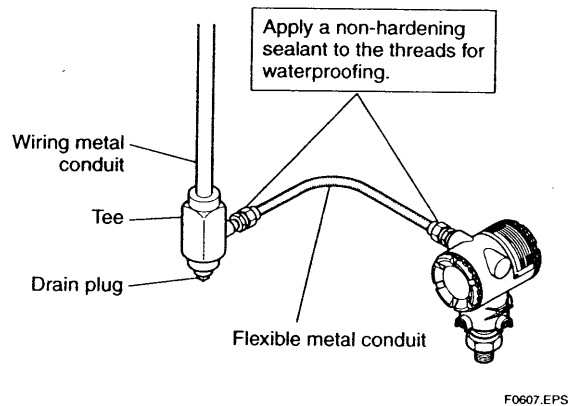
Typical Wiring Using Flexible Metal Conduit
